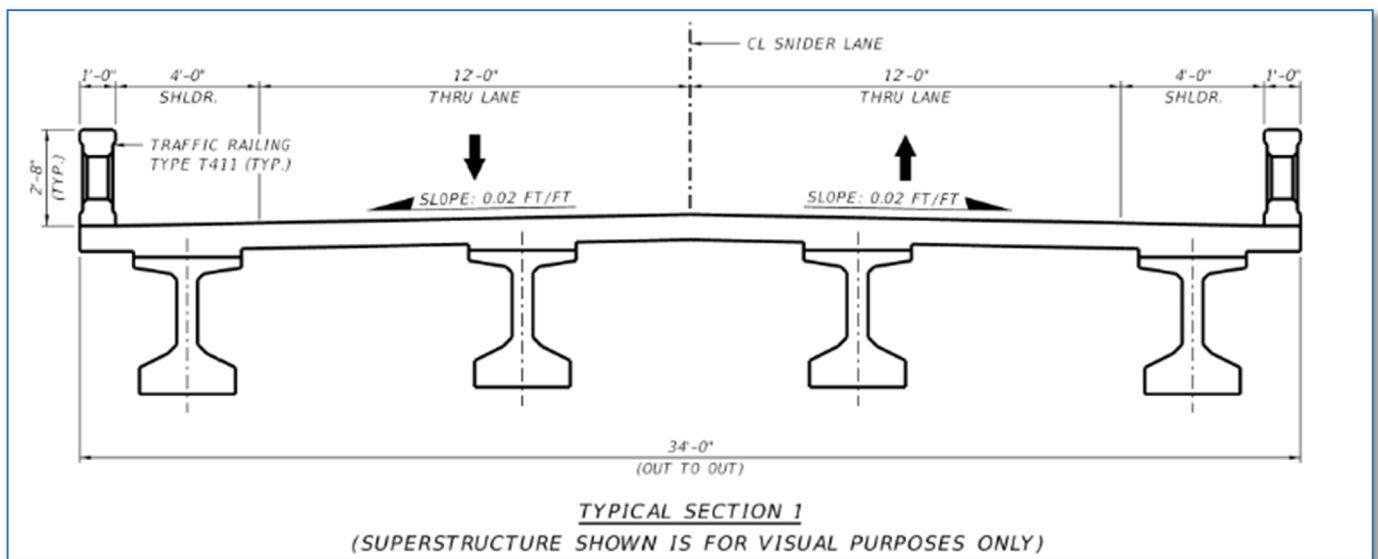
Snider Lane Typical Section at White Rock Creek
